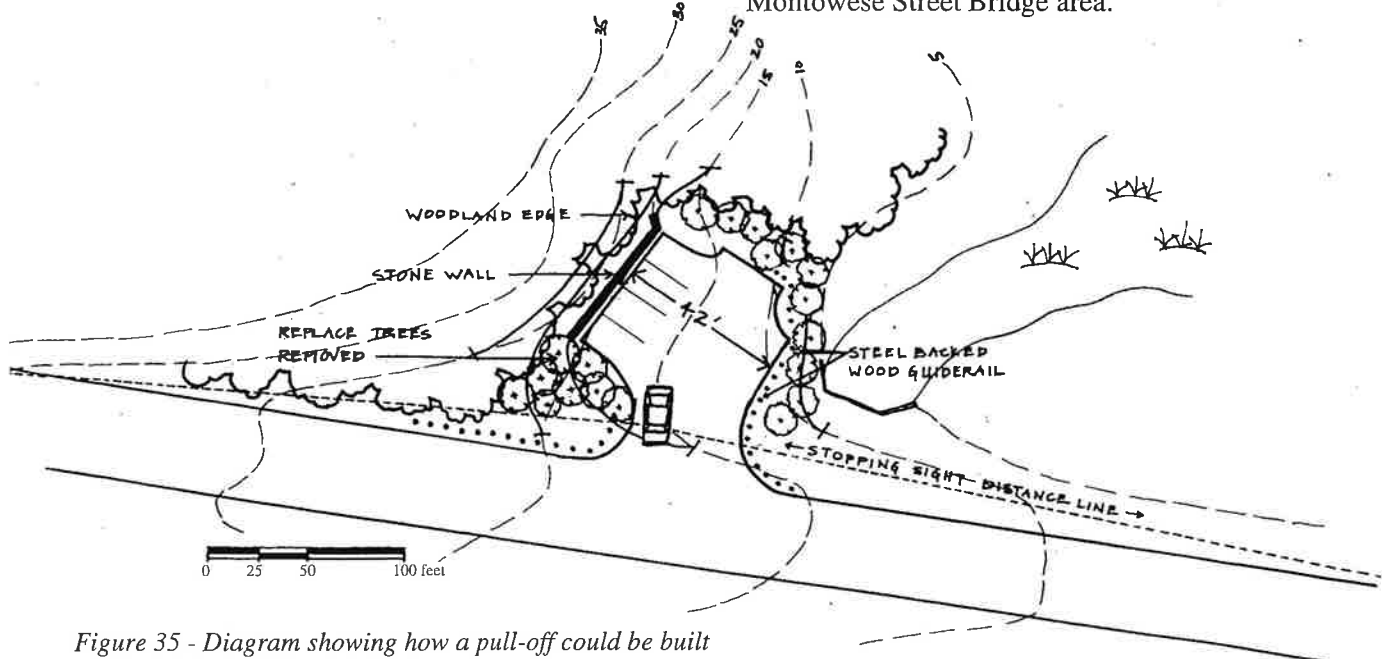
Diagram showing how a pull-off could be built at the crabbing site.
